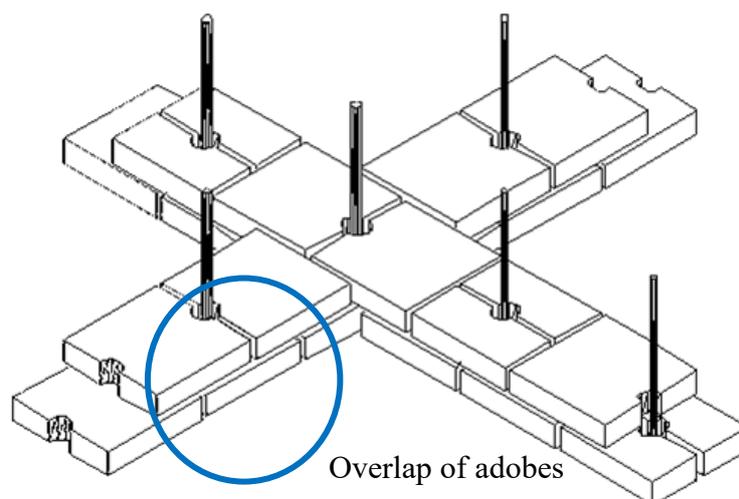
Overlap of Adobes. Made by: Joaquin Chocano
